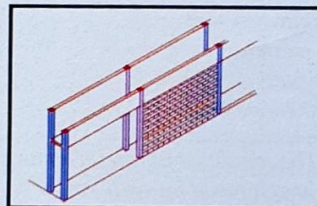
(b): Alternating temporary sandcrete blockwall to prevent lateral movement
